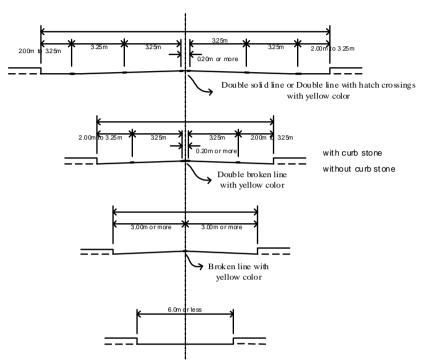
Design Standard of Longitudinal Pavement Markings Notes: the red line indicates position of the centerline in the figure above.
